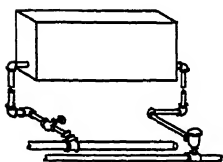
HEATING UNIT WITH VALVES IN BASEMENT
